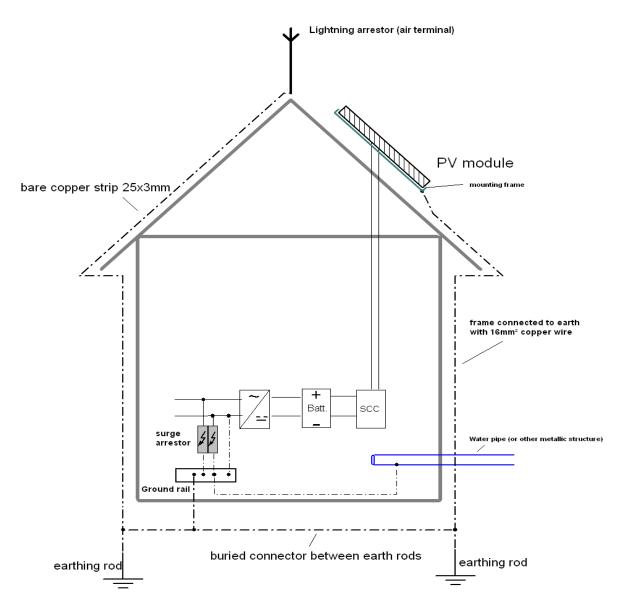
Equipotential bonding for grounding and Lightning protection for a solar-PV site
